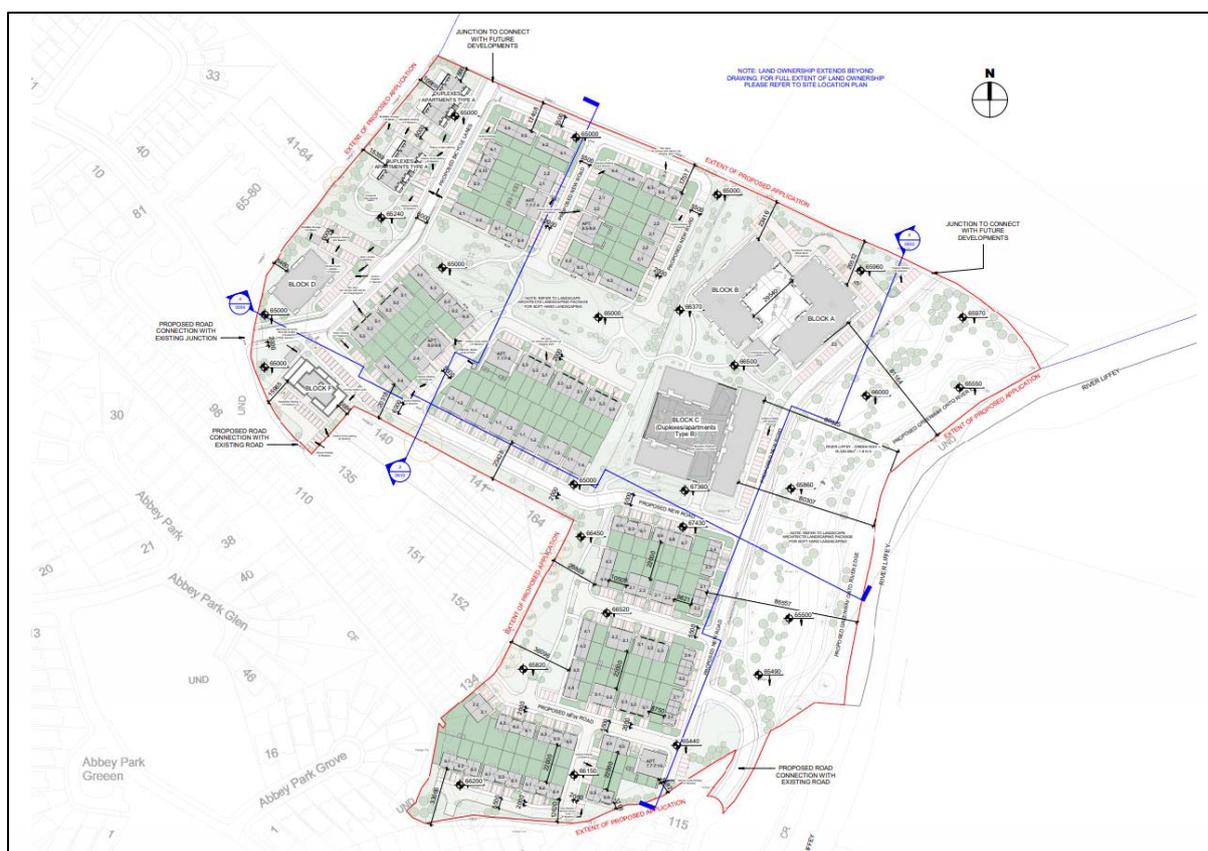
Site layout plan of proposed development of 333 no. residential dwellings.
